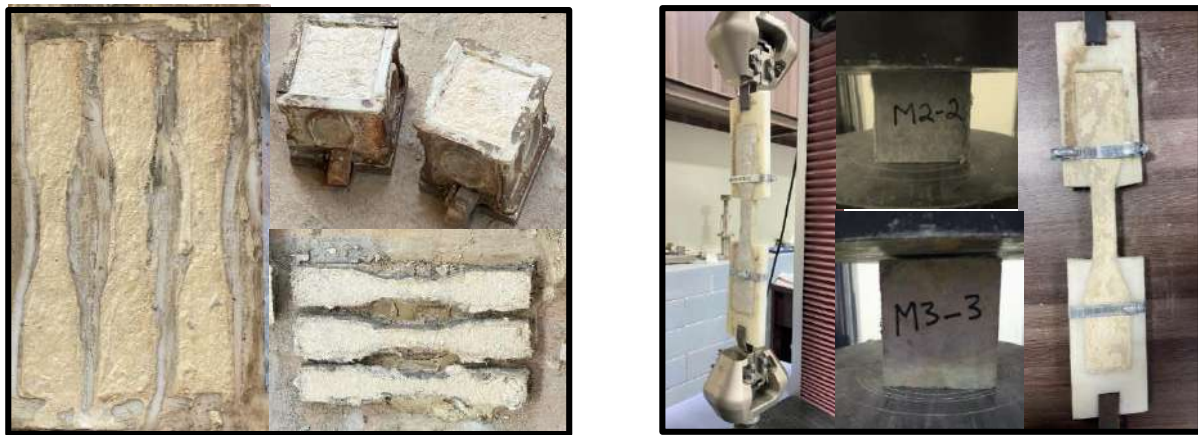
(a) Casting of Dog bone sample dimensions as per JSCE and cubes (b) Uniaxial tension testing setup and compressive testing .
